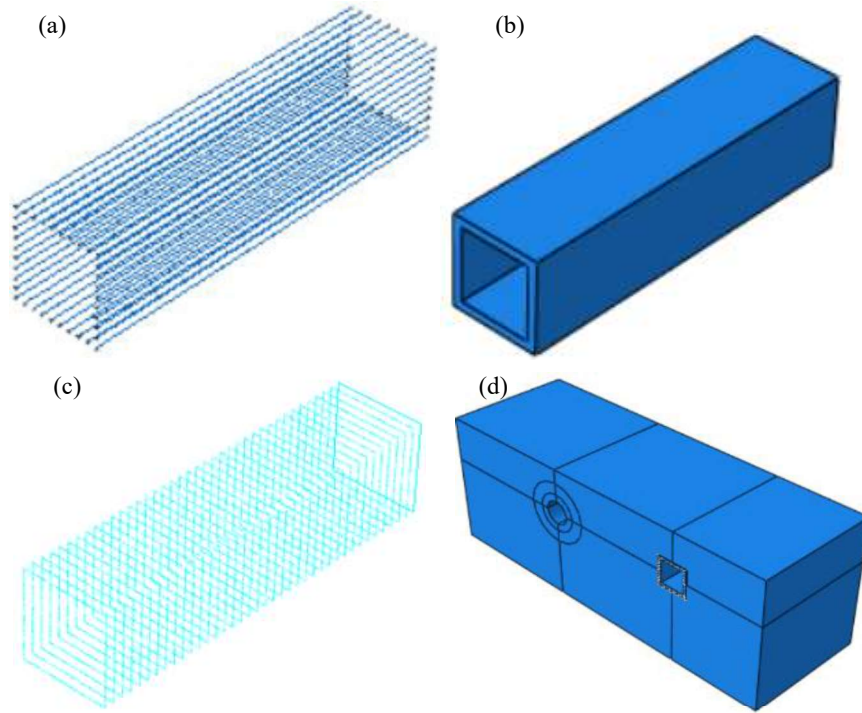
Tunnel (a) longitudinal reinforcement bar (b) concrete (c) transverse reinforcement bar (d) isometric view of combined finite element model
